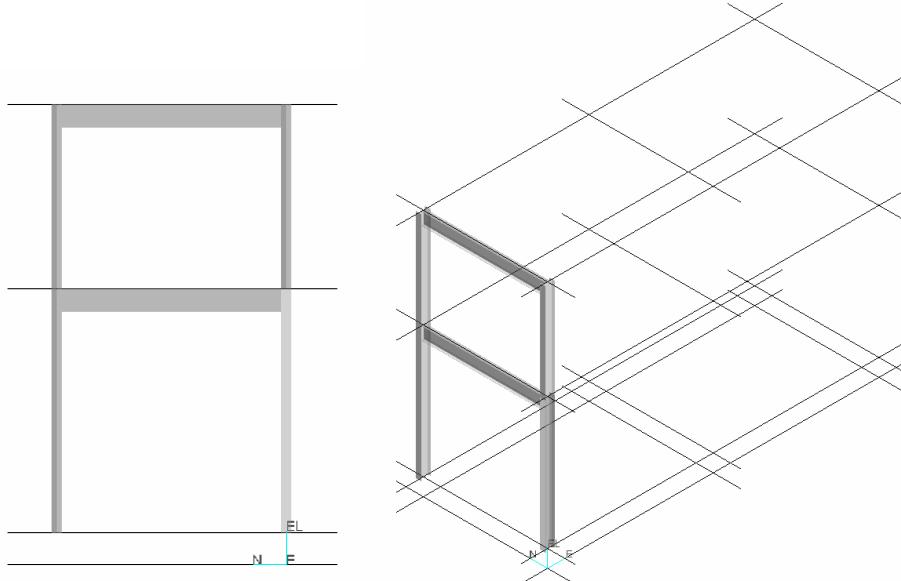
Elevation and Isometric View of the Structure Unit 2 System
